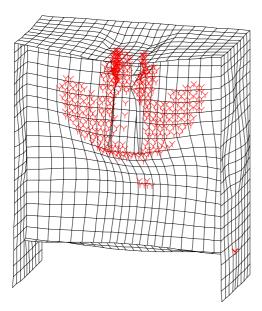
Pier 1 & 2 Diaphragm Beam FEA
